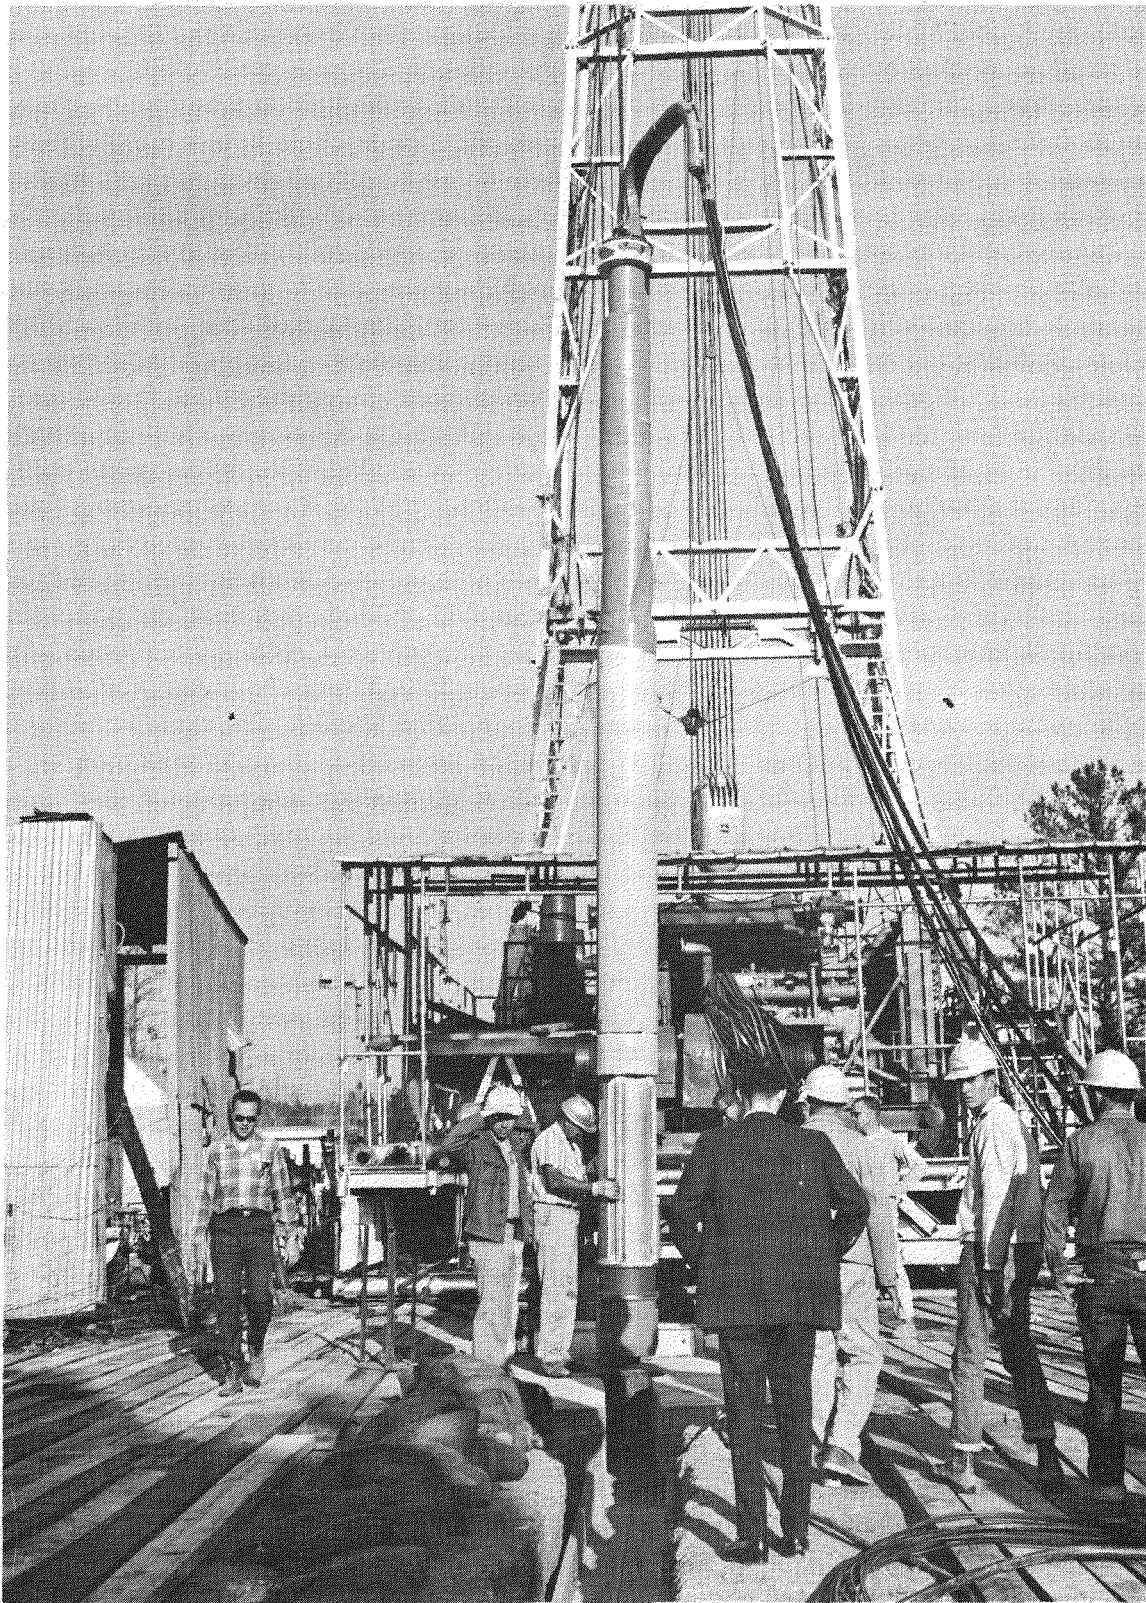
Device Canister Being Lowered into Emplacement Hole
